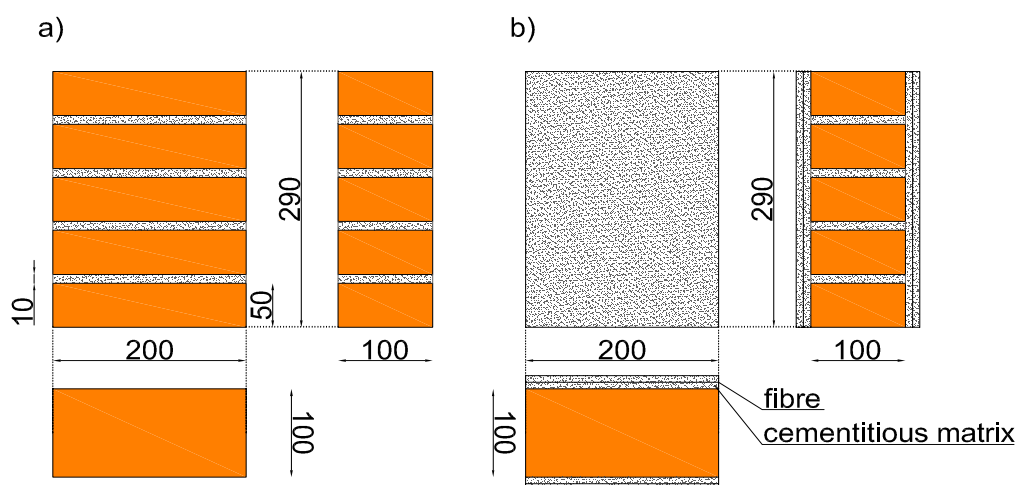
Graphic scheme with measurements (mm) of the brick masonry pilasters, plan and elevations, a) unreinforced pilaster, b) reinforced pilaster.
